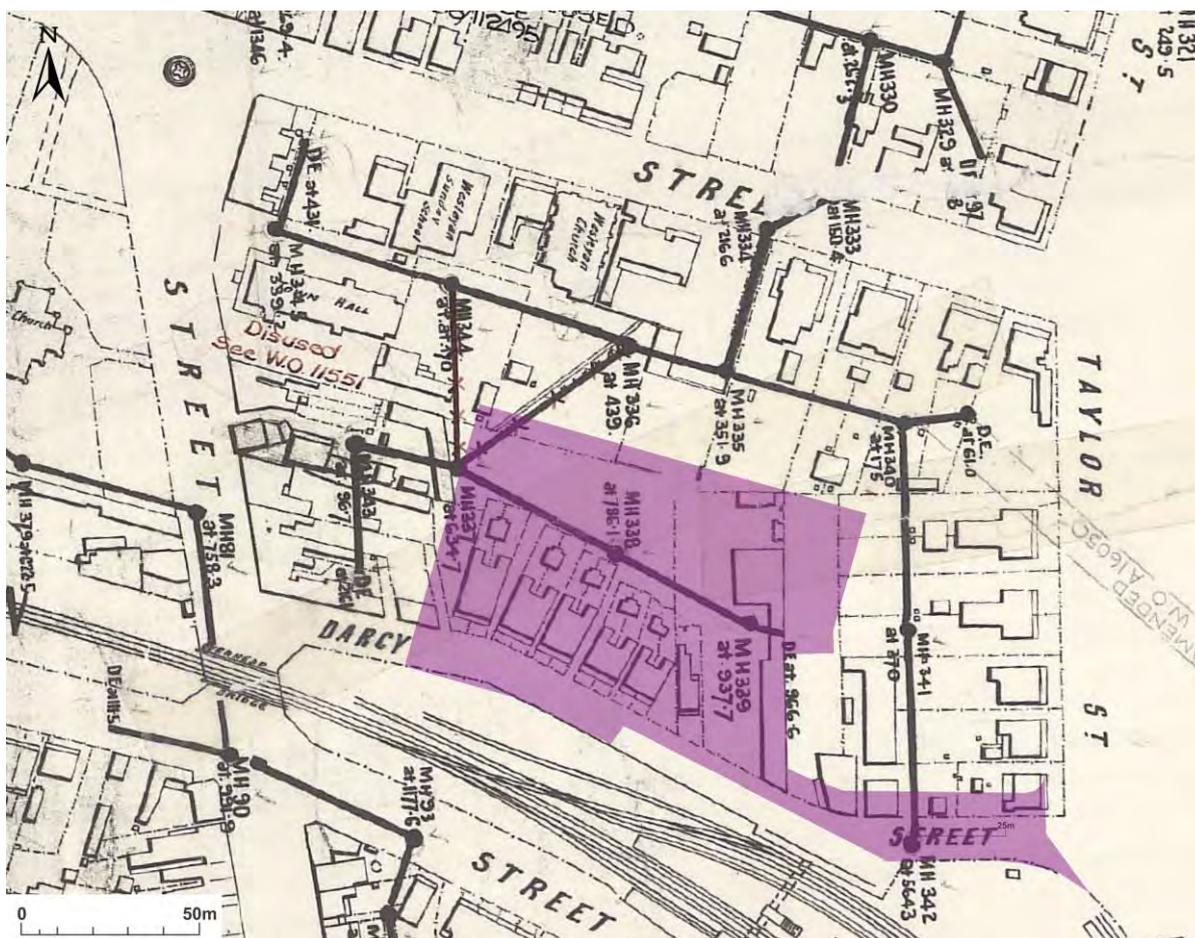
1907 sewerage plan showing the open drain channel from the 1895 plan and a later sewerage line parallel and to the east. Sydney Water Archives.
